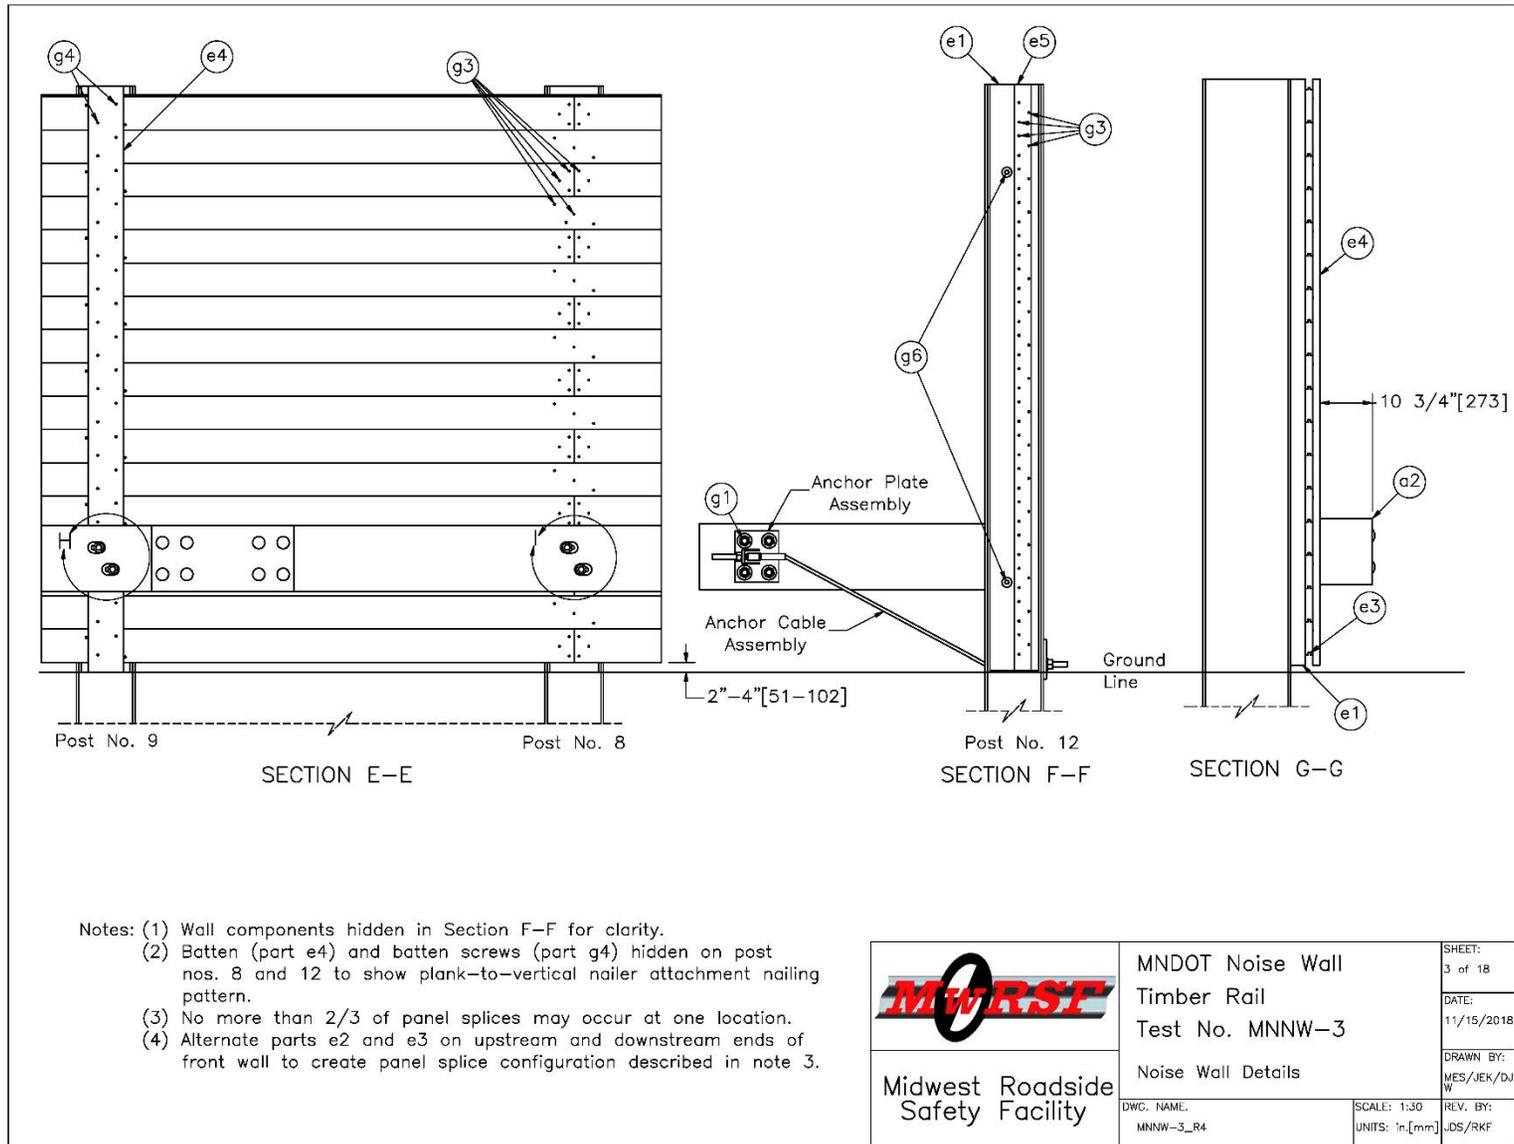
Noise Wall Details, Test No. MNNW-3 (Recommended updates provided in Chapter 12)
